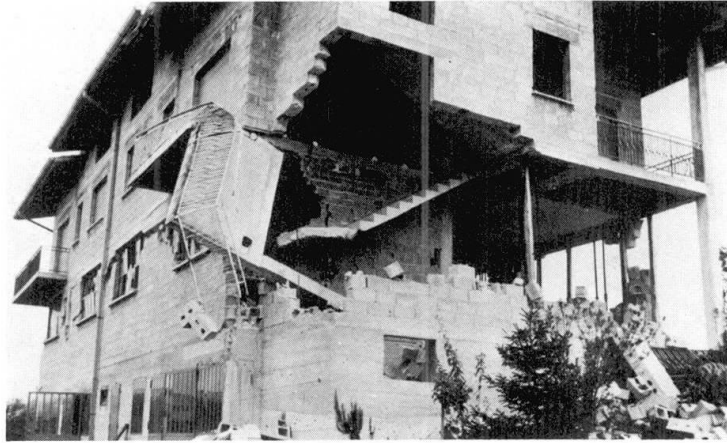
(after September 15th: Residential building with workshop near Artegna after renewed earthquake stress. The side wall in the middle floor collapsed under further earthquake load. The door and window jambs on the longitudinal walls shattered and partially collapsed. The shear resistance of these concrete block walls was minimal due to failure of the mortar joints to prevent the layers from shifting.
